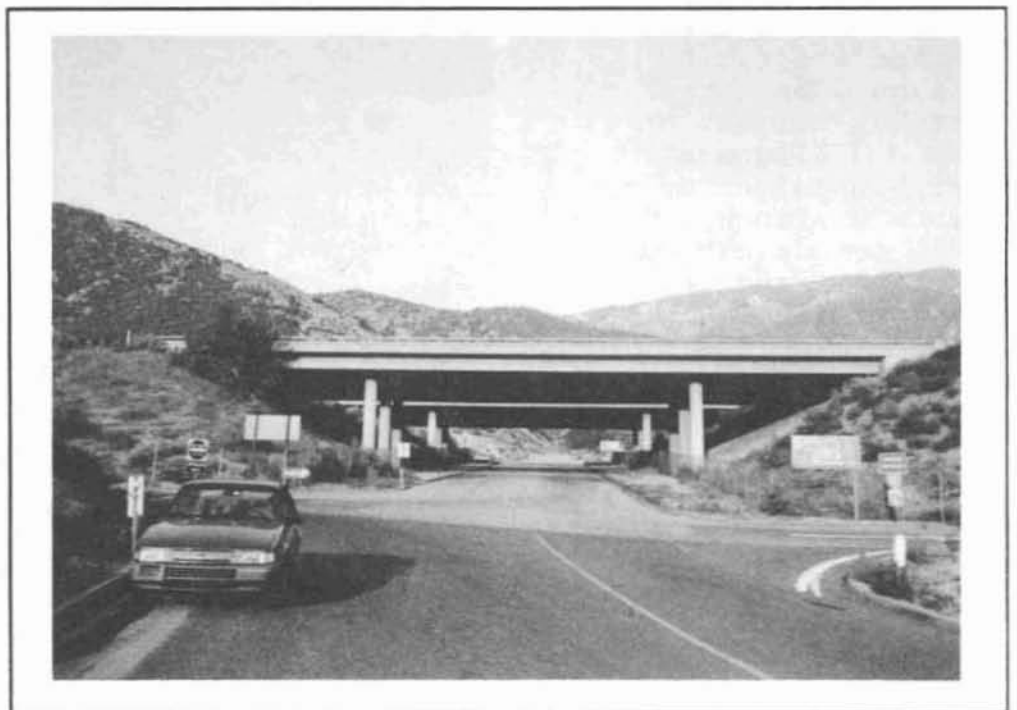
I-15 Bridge Over Kenwood Avenue
